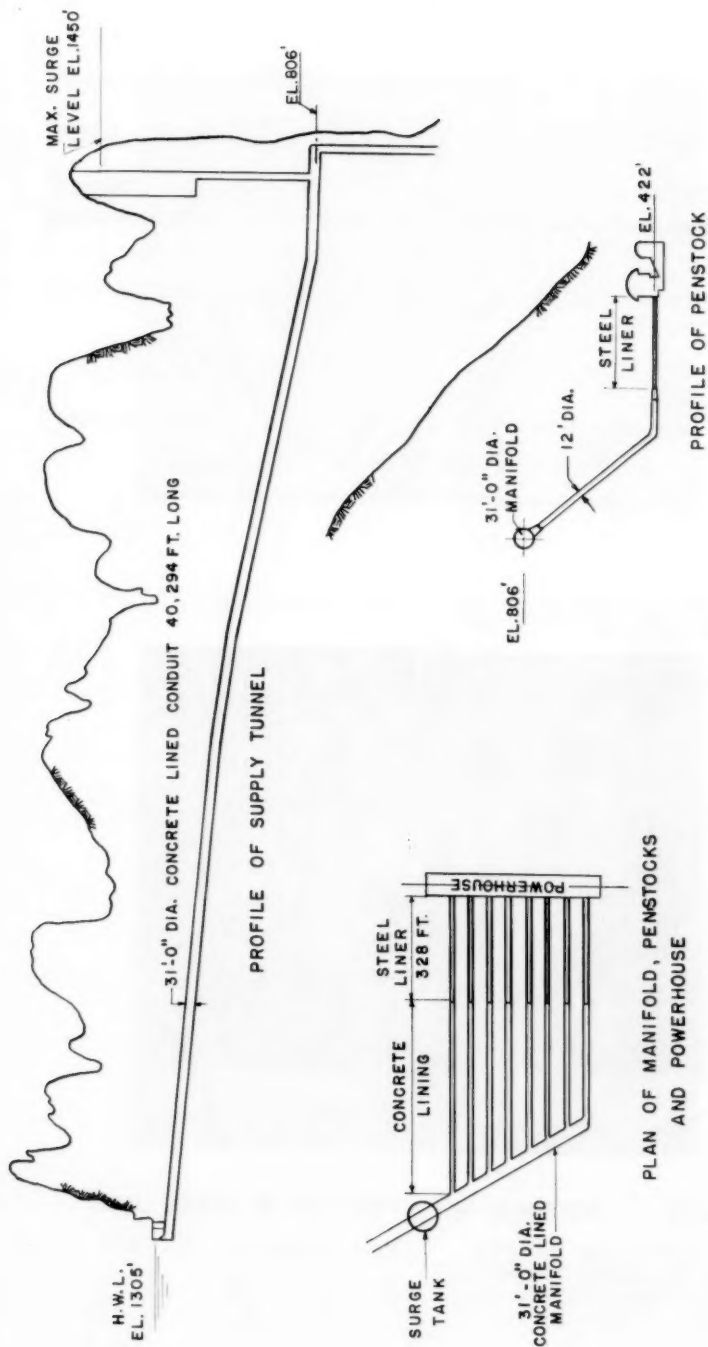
PLAN AND PROFILES OF BERSIMIS NO. 1 DEVELOPMENT
